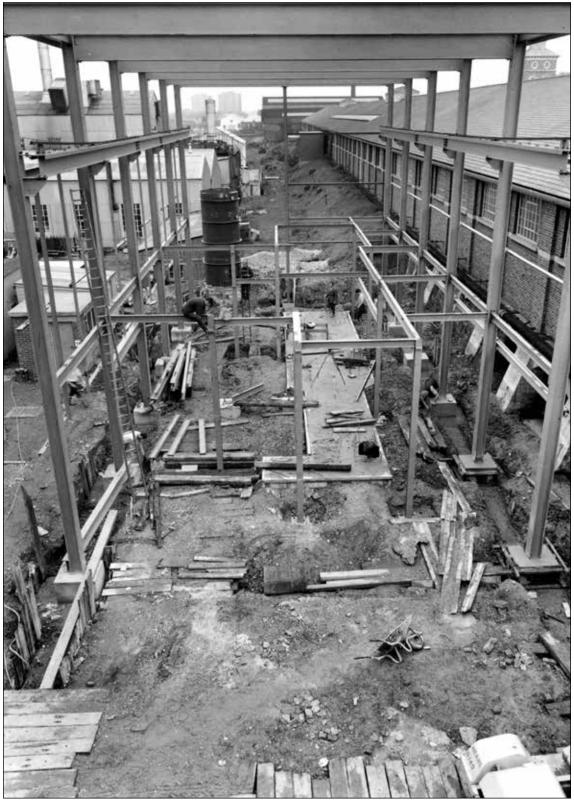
The building to house the circulating water channel under construction in 1970. The buttressed piers of the arcade which carry the tank building of No 2 Ship Tank were exposed during the work and can be seen in the right of the picture. The tank which supplied the water channel can also be seen at the far end of the building (IWM 2005-02-20 468/70)
